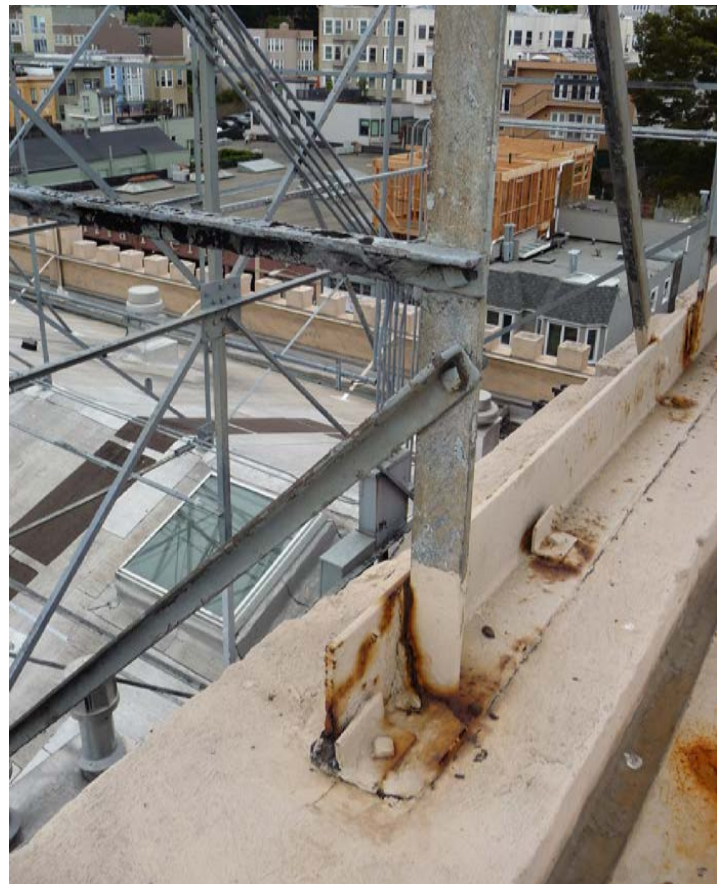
A typical "good" condition connection of the armature, on the lower roof (Mustard Building), within easy arm's reach
